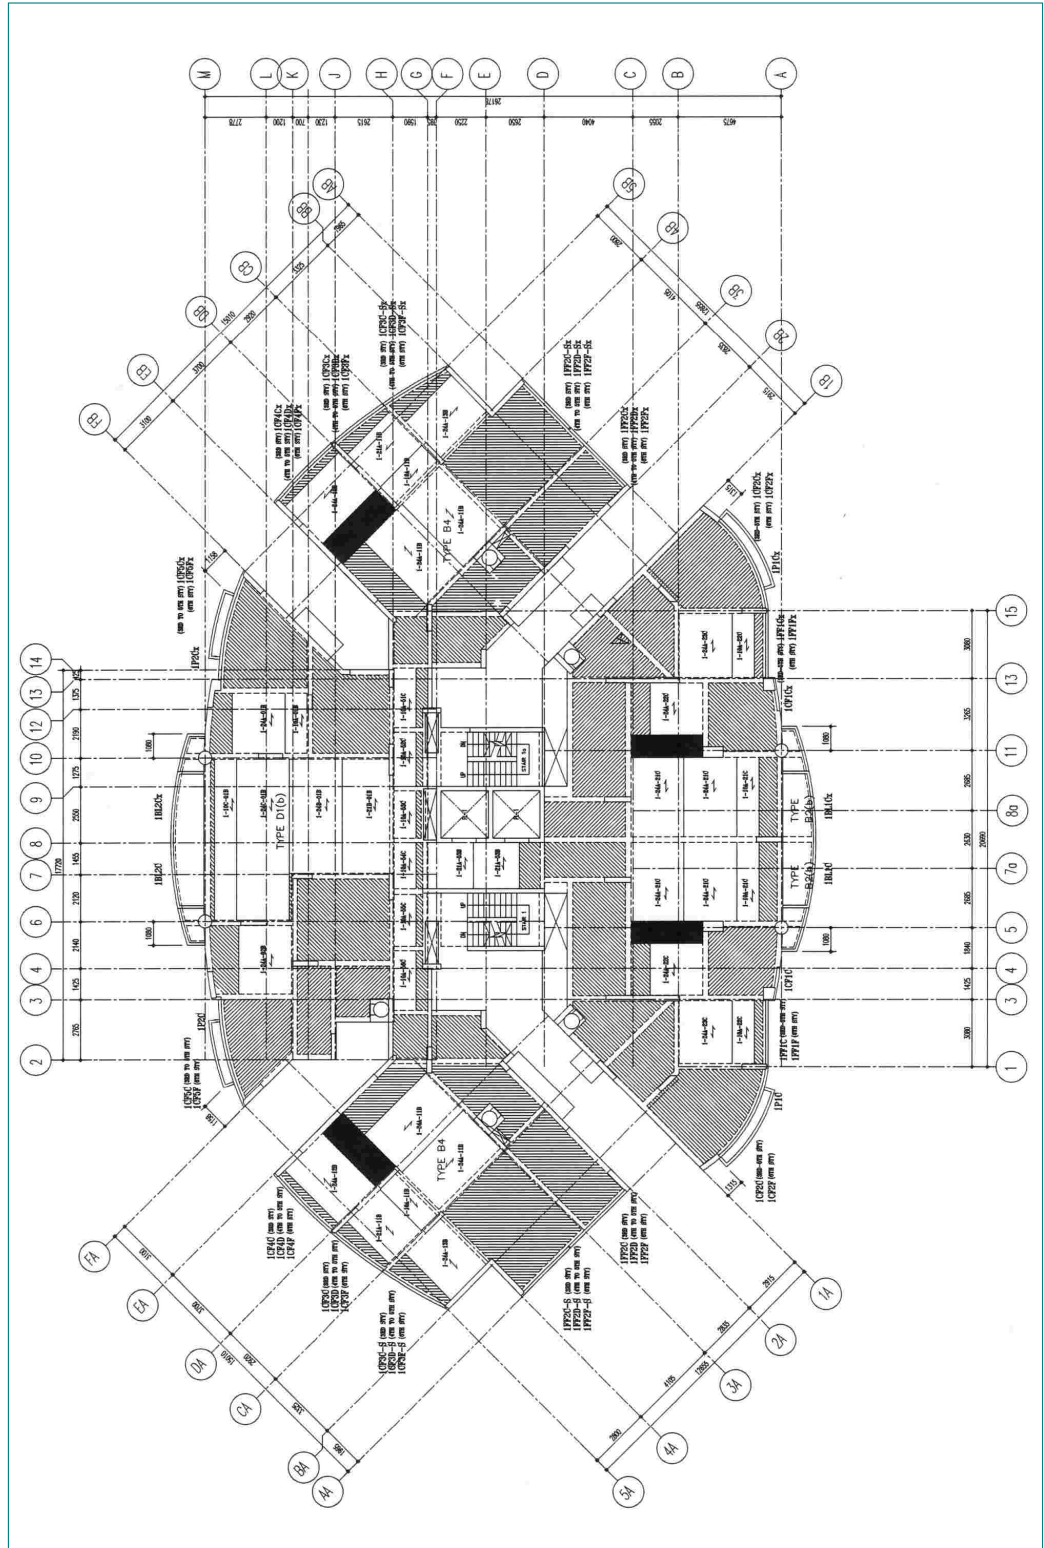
Typical floor layout showing floor & façade details and references
